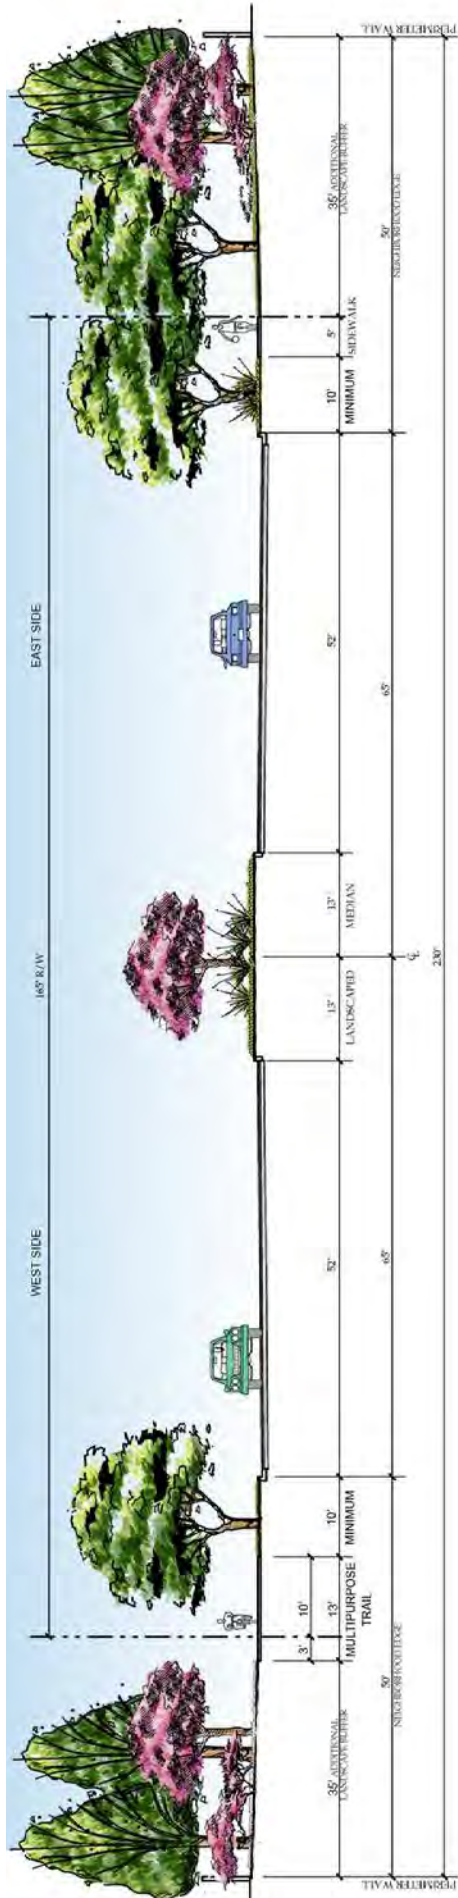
I—STREETSCAPE/PASEO SECTIONS
